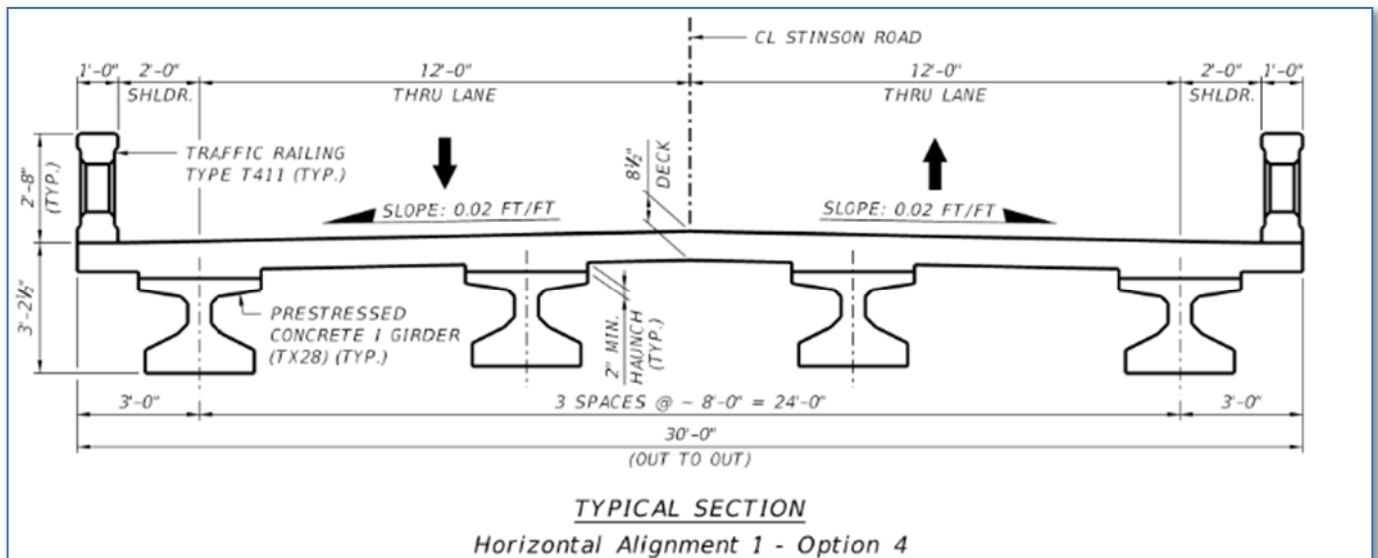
TxDOT Prestressed Concrete I-Girders (TX28) Typical Section
